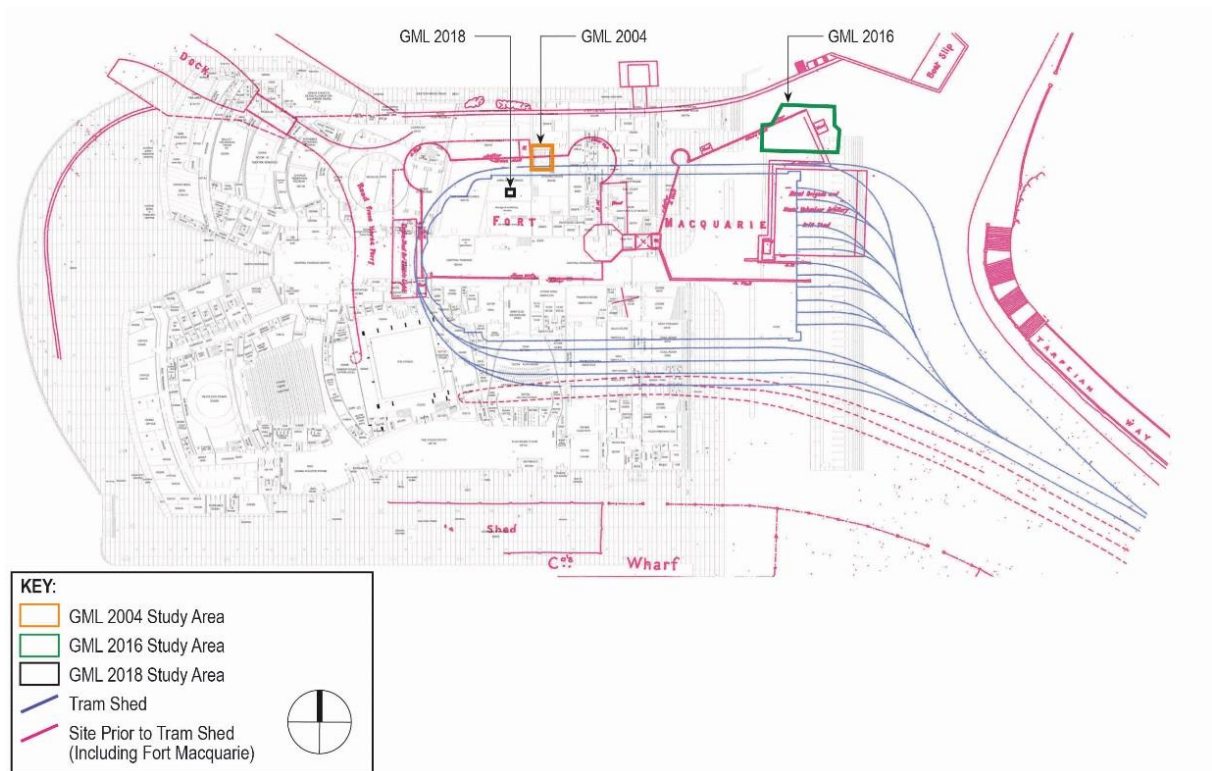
Location of relevant prior archaeological excavations, with historical plans showing Fort Macquarie and the Tramcar House, with the current SOH plan. (Source GML 2018)
